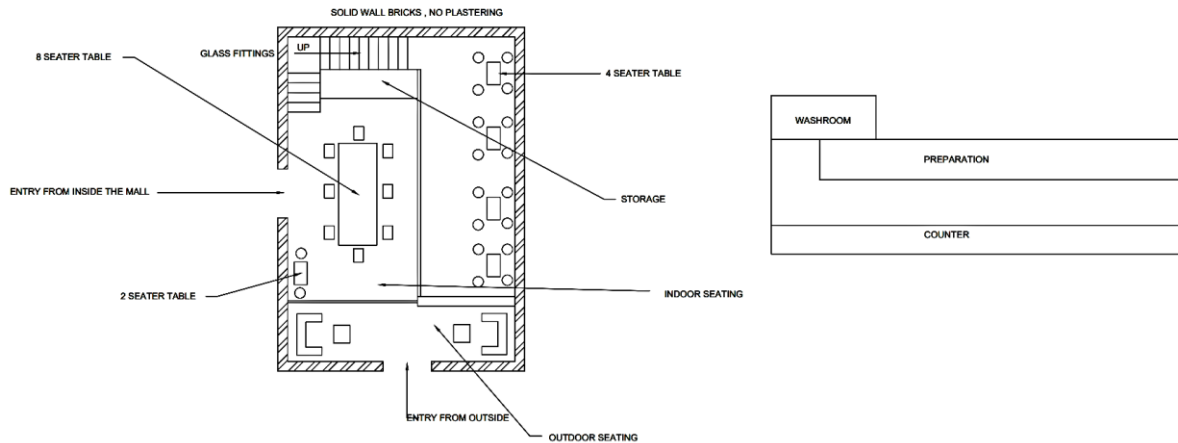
Floor plan layout of Café Coffee Day [CCD] at Esteem Mall, Bengaluru and Figure 4 – Layout (Source: Authors)
